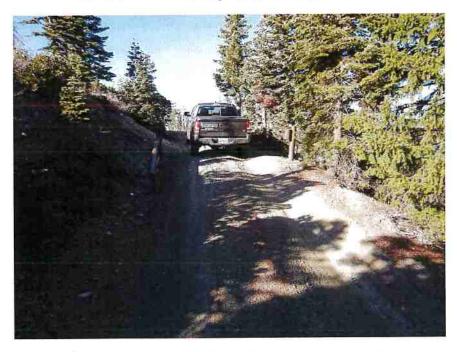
RP 2. Vehicle traveling north, photo taken facing north.
